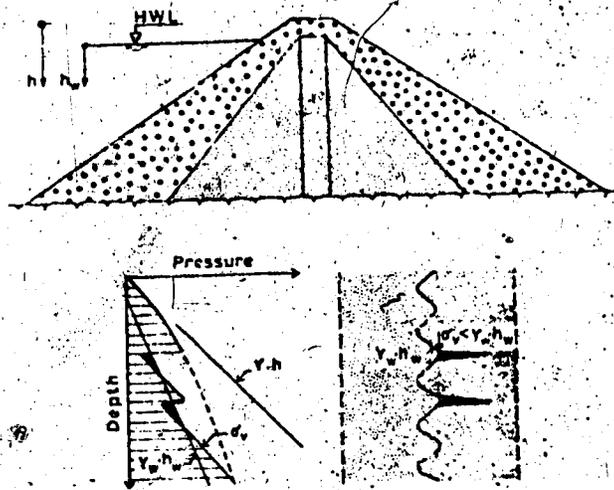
HYDRAULIC FRACTURE MECHANISM
